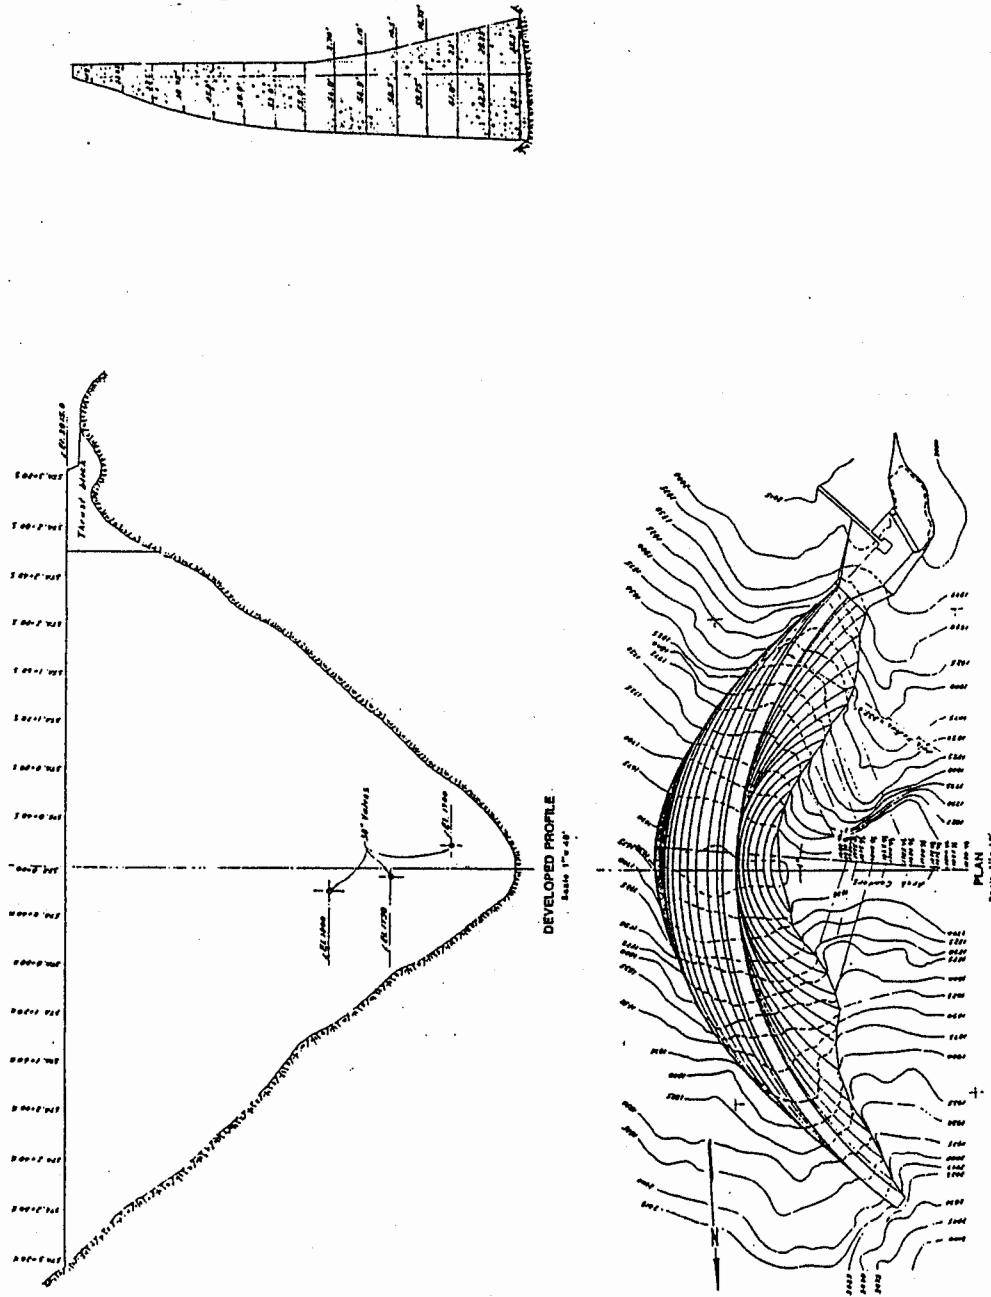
Plan, Profile and Crown Section of Pacoima Dam from Original Construction Drawings (County, 1983)
